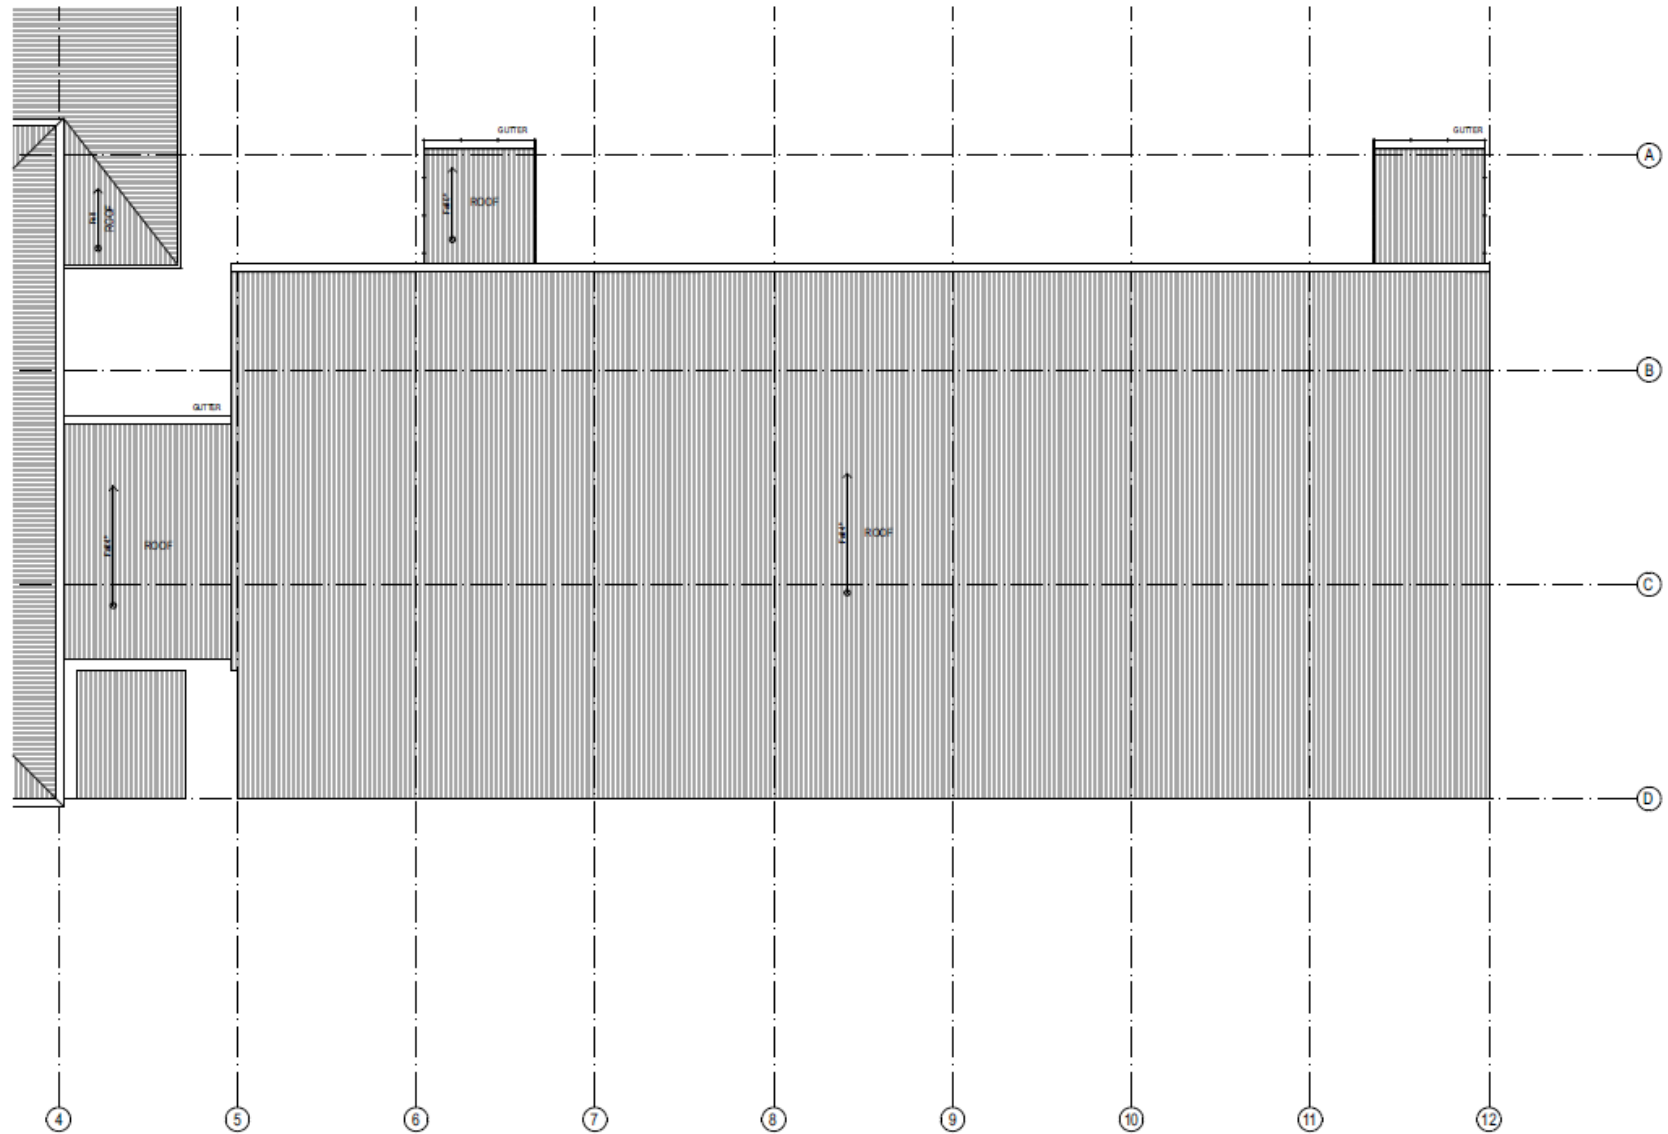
Building I Roof Plan. Source: Fulton Trotter, 2021; Drawing No. SD-2007, Rev F, 13.8.2021.
